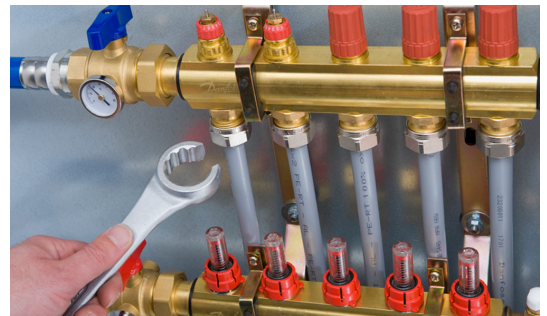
Tighten compression fitting nut with a 30 mm open ended spanner.
